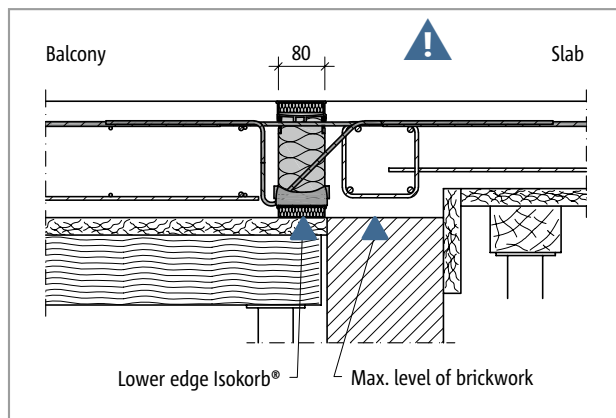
Schöck Isokorb® T type K: In situ concrete with height offset floor on masonry wall
